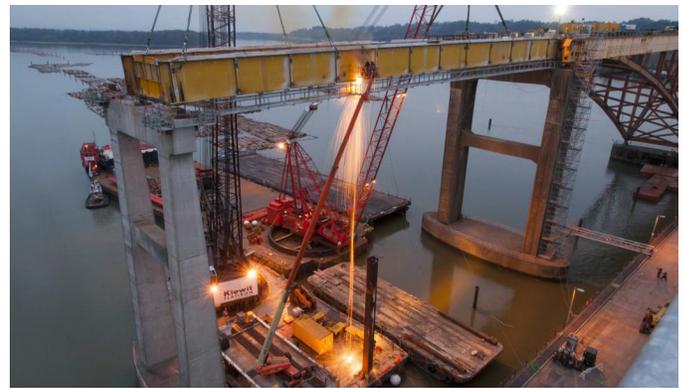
Girders on the bridge approaches were cut into sections with thermal lances. Cranes supported the girders and lowered them onto barges.
